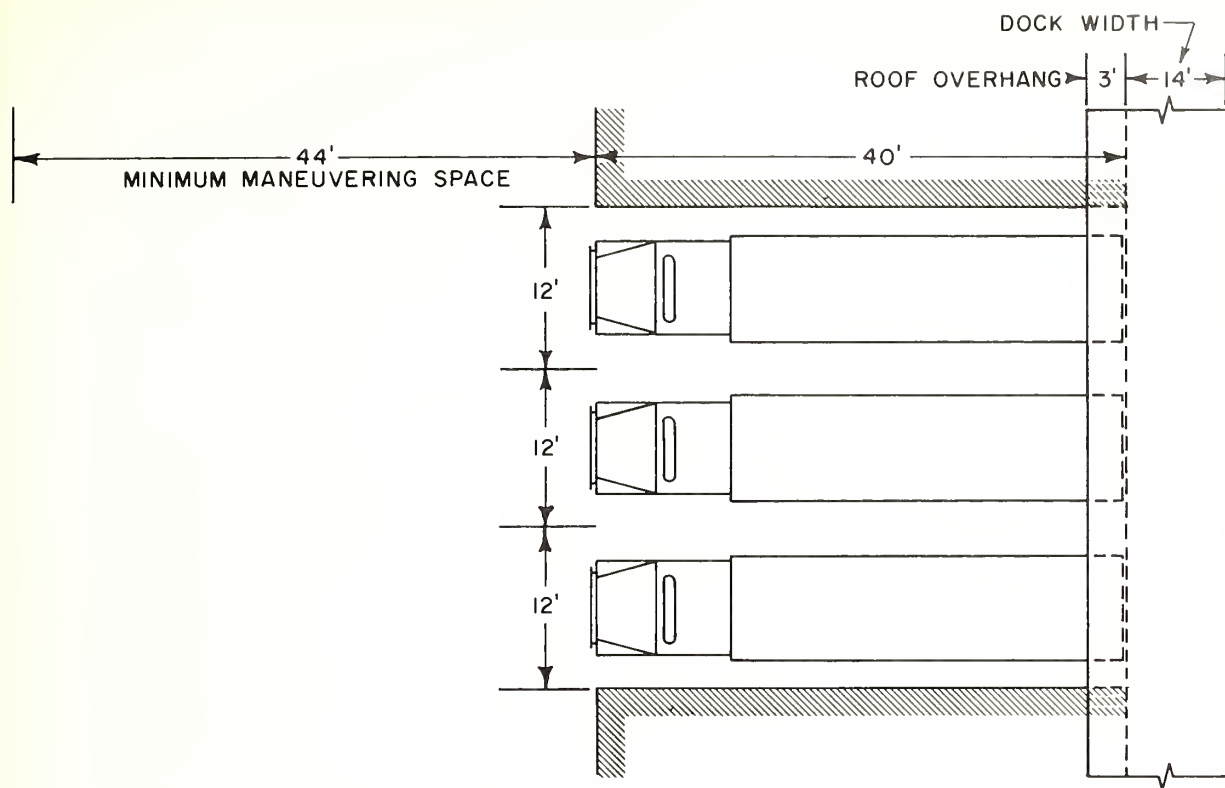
Recommended dimensions for minimum dock, truck bay, and maneuvering area in a poultry-processing plant.
